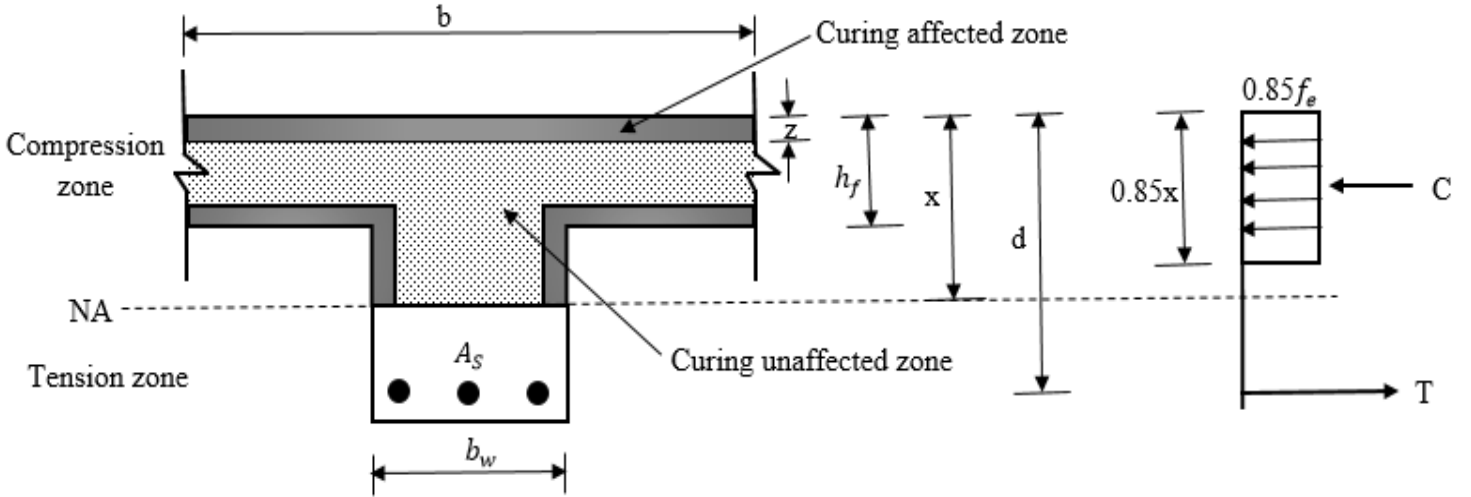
Cross-sectional view of T-section singly reinforced beam (NA within the web)
